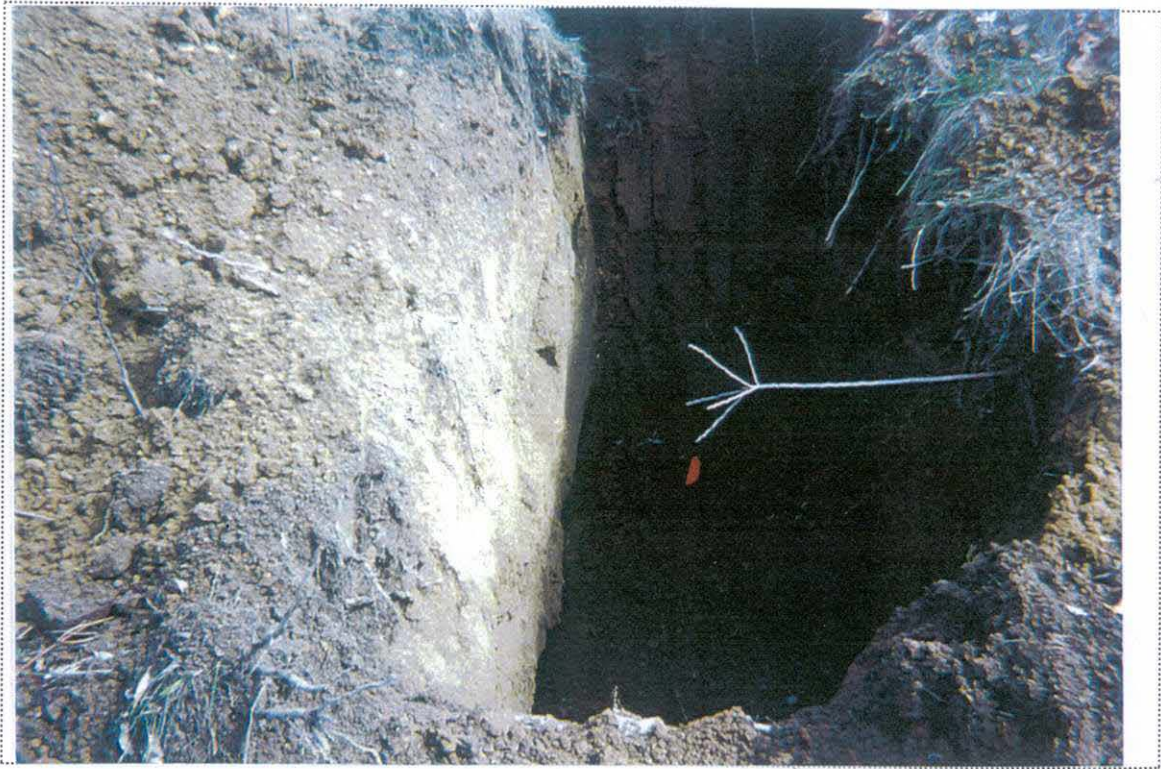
View of exploratory test trench adjacent to a former building pad along Watson Avenue (looking south).
